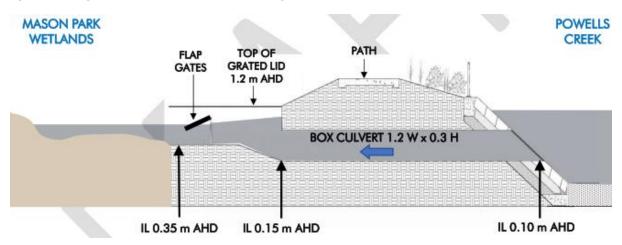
Existing inlet/outlet structure on Powells Creek at Mason Park
